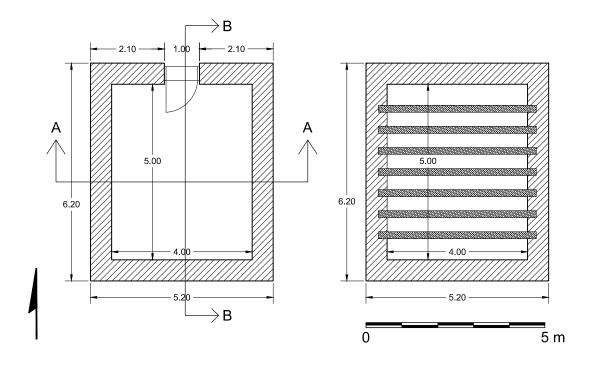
Plan showing walls and door (left) and setting of ceiling beams (right) Alternative plans are also being considered at this stage of design.
